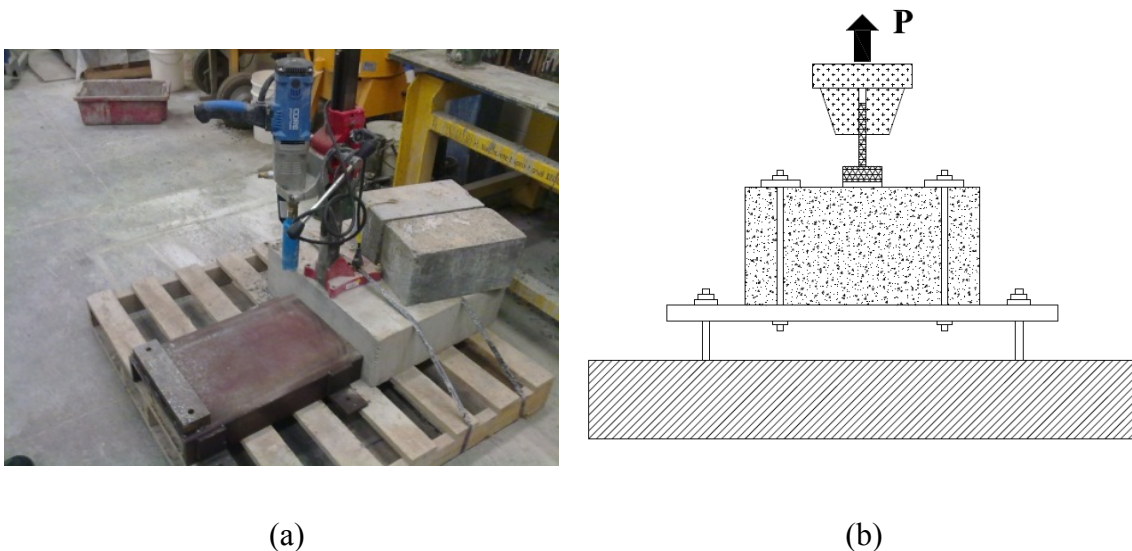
Direct tension test (a) core drilling machine, (b) test set-up
